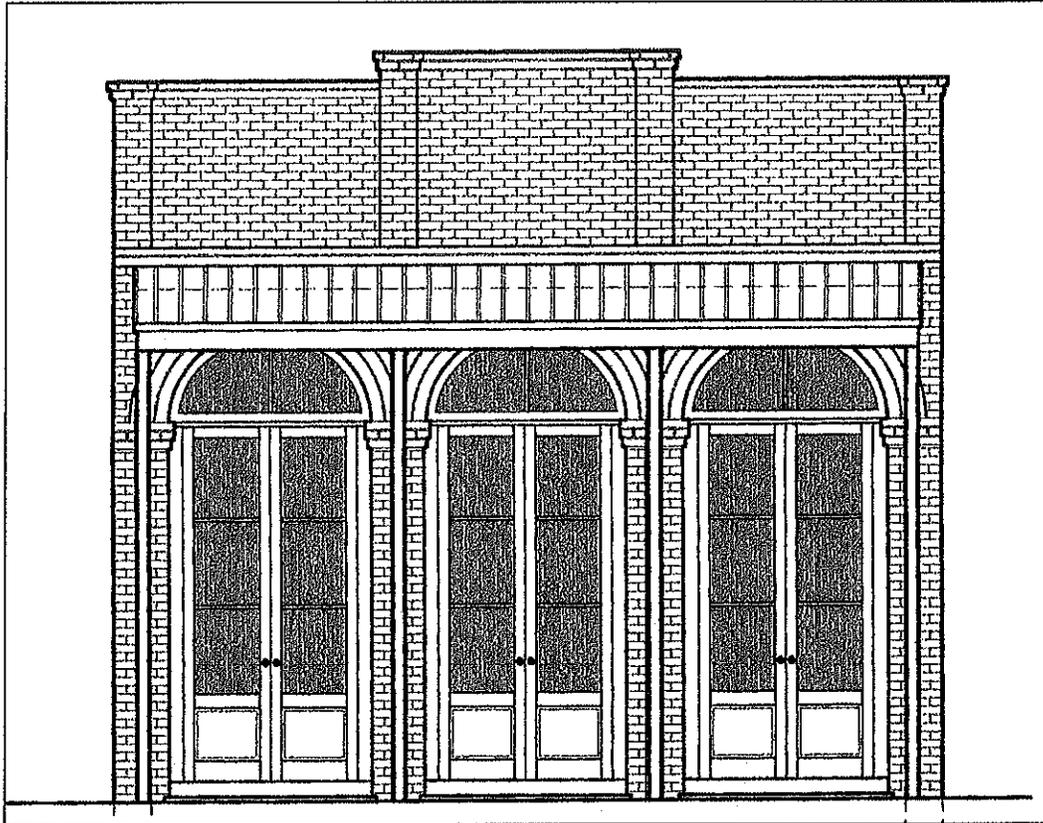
Conceptual drawing of the front facade of the Chinese Building (Wing Hong Hai Co.) standing at 210 E 1st Street. Illustration shows a reconstruction of the canopy that once spanned the sidewalk, and doors and windows restored to their original appearance. Façade improvements to this building will be completed in Phase 1 of the redevelopment.
